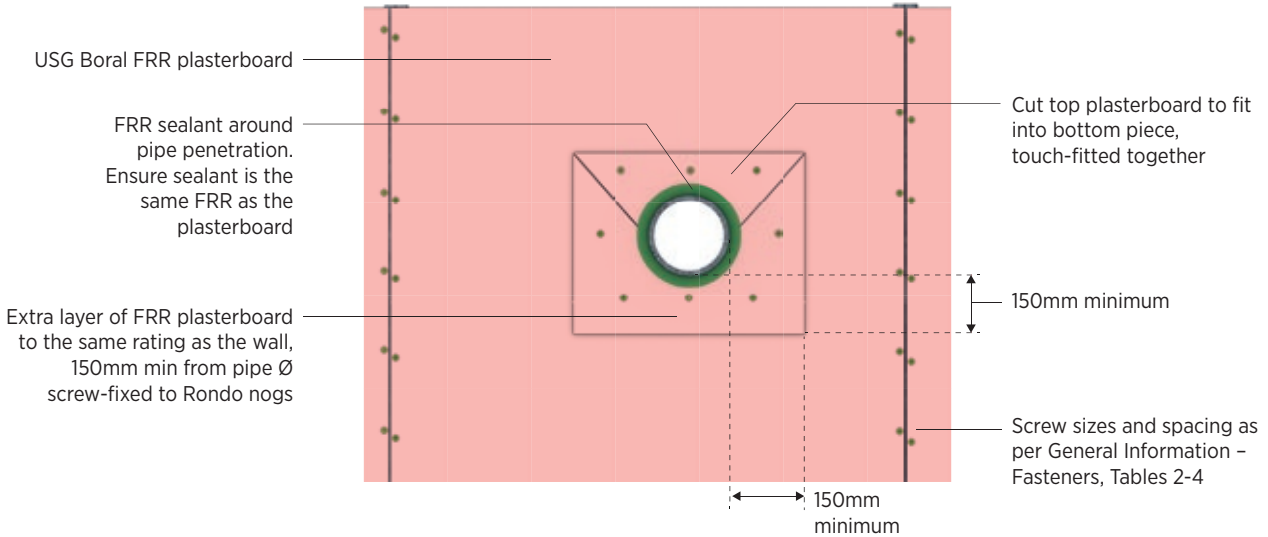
Penetration Details - Fitting Extra Plasterboard Layer
